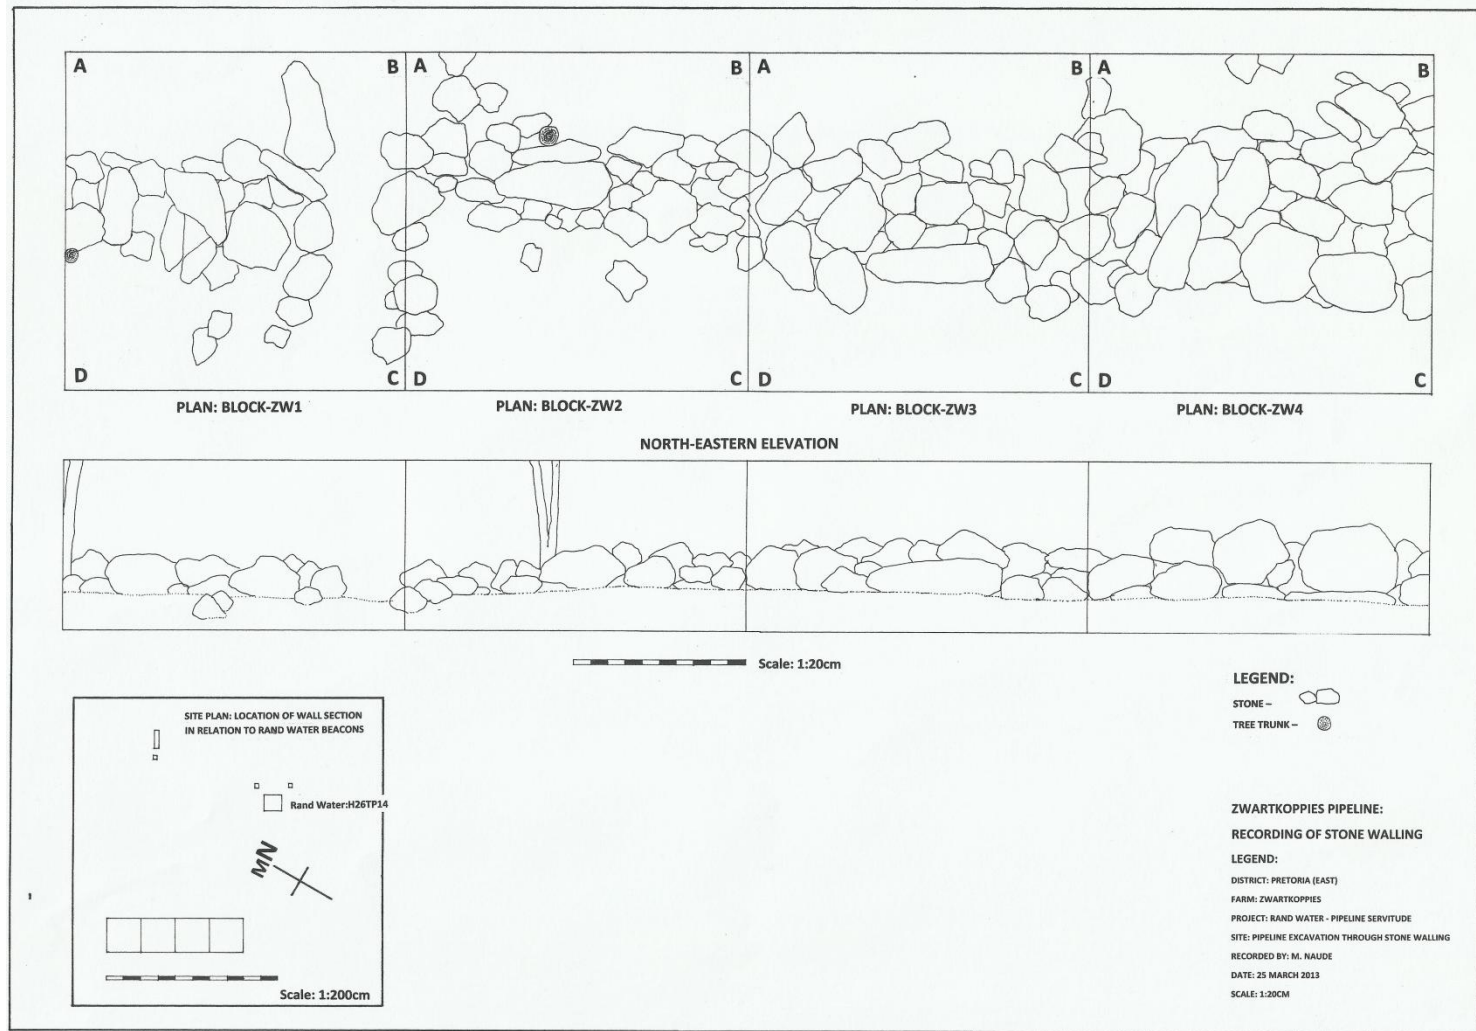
Plan and elevation of a section of the remains of a stone wall to be impacted on by the proposed new pipeline installation on the farm Zwartkoppies (Drawing: M. Naude 2013)
